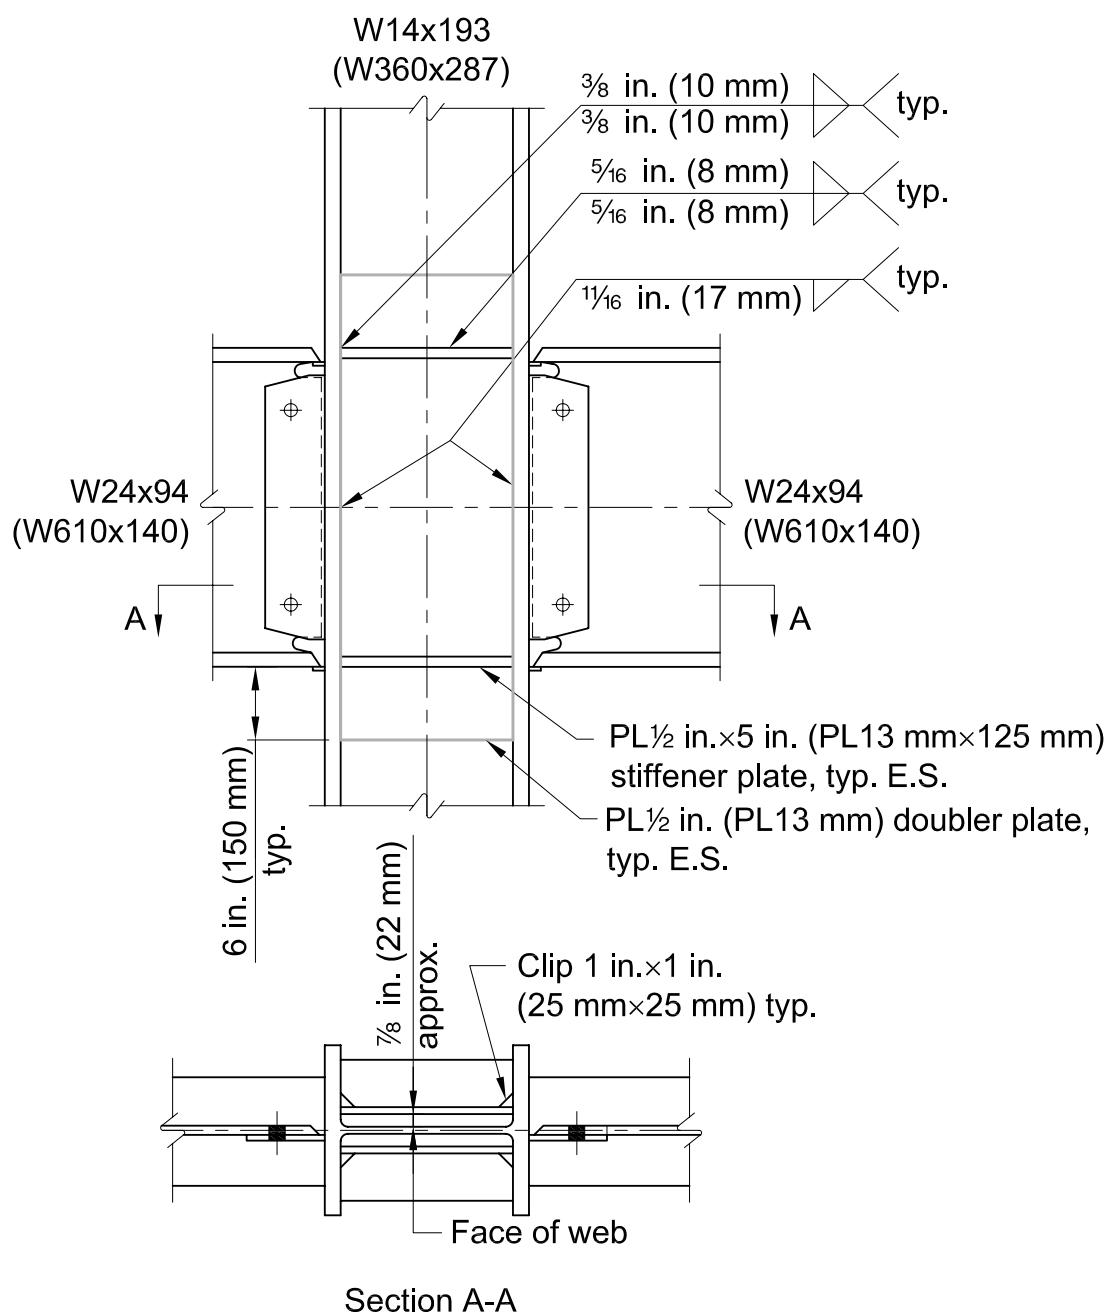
Example of fillet welded doubler plate and stiffener details.
